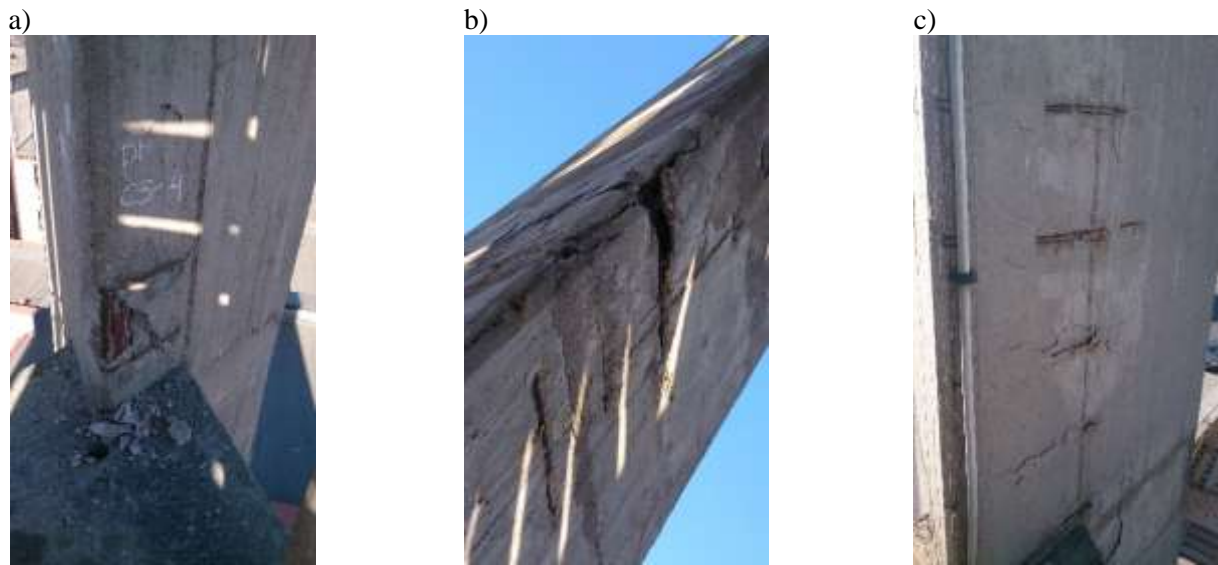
Examples of damage to reinforced concrete, monolithic columns of the belfry tower: a), b), c) detachments and losses of the concrete cover and corrosion of the reinforcement bars (photo by Maciej Niedostatkiewicz)
